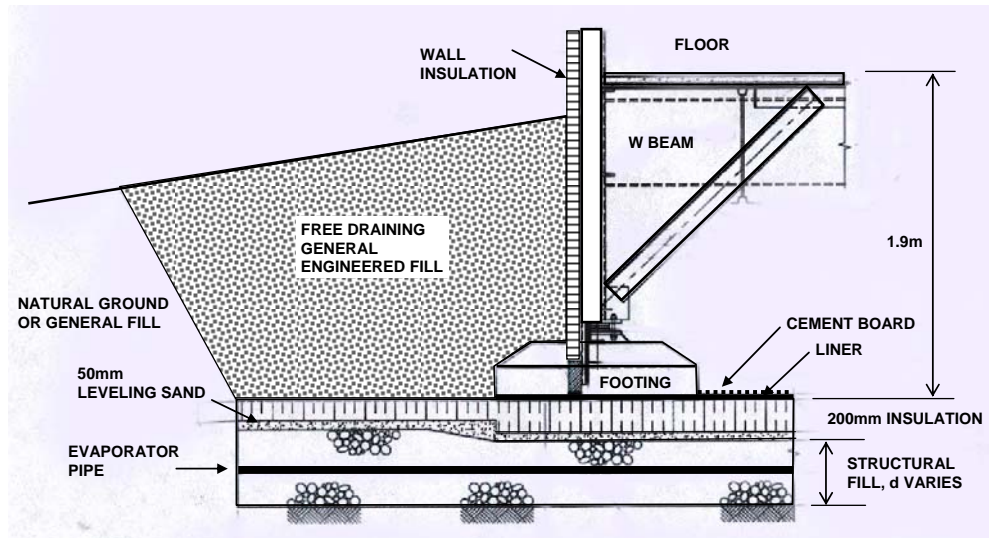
Foundation design at building perimeter for hospital, Inuvik, NT
